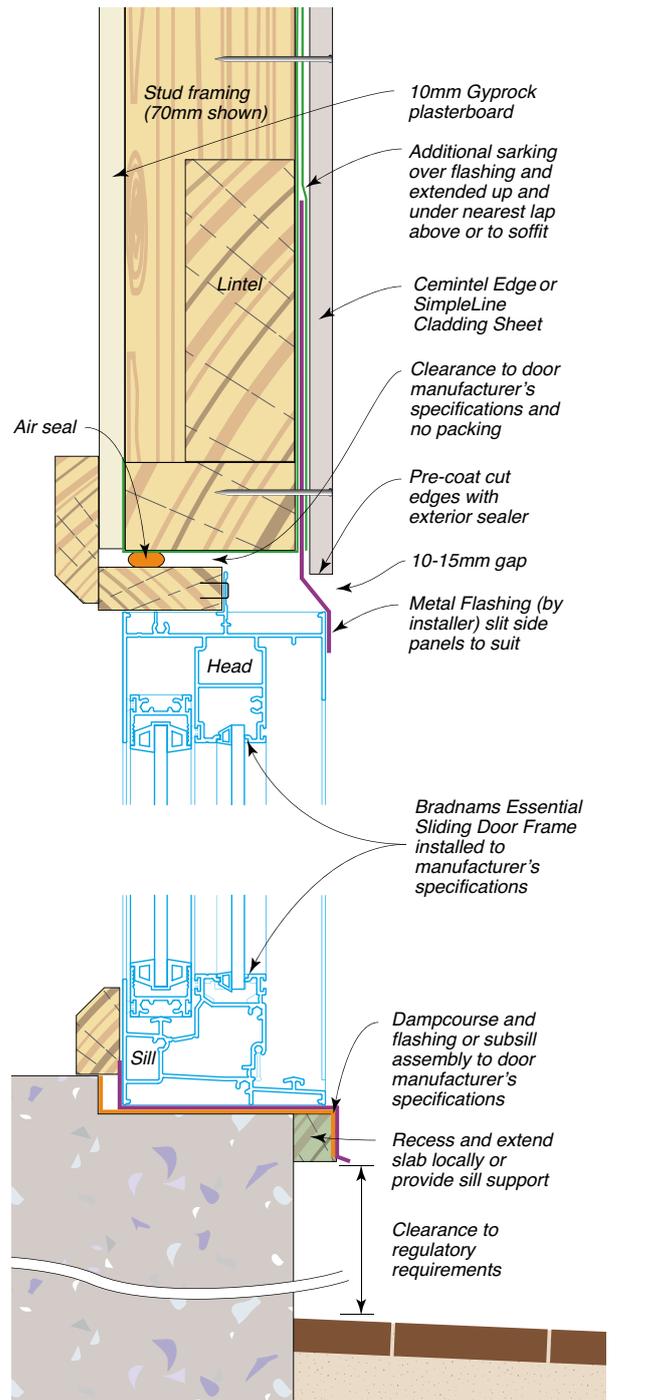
Bradnams Essential Sliding Door Installation – 70mm Framing and 80mm Reveal Shown
